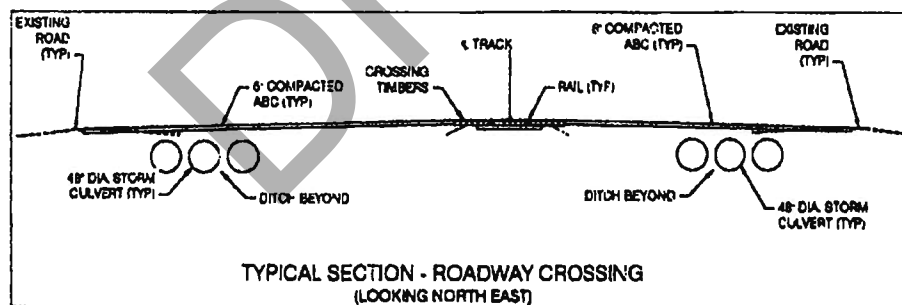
Typical cross section, looking side-long at the rail, for rail corridor areas including 48 inch culverts.
